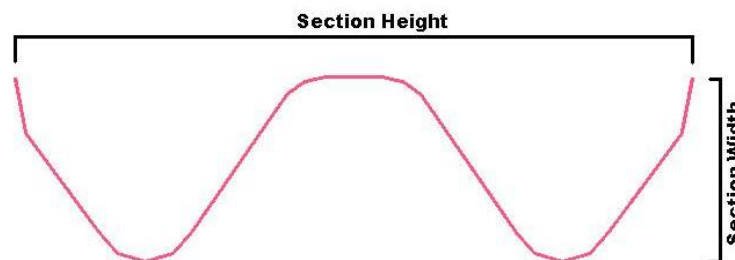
A cross-section of an undeformed w-beam guardrail. In application, the rail would be mounted on posts so that the section height is vertical rather than horizontal.
